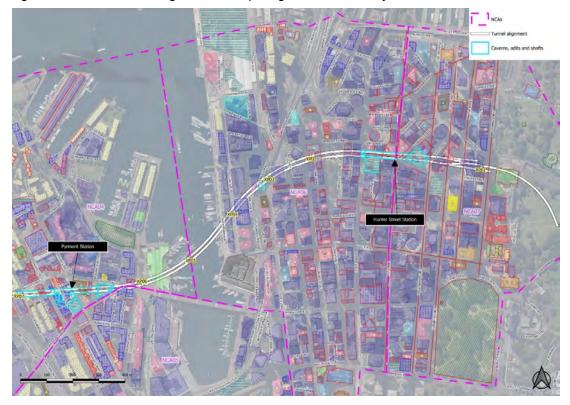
Mainline tunnel alignment, cross passages and caverns - Pyrmont to Hunter Street Station
